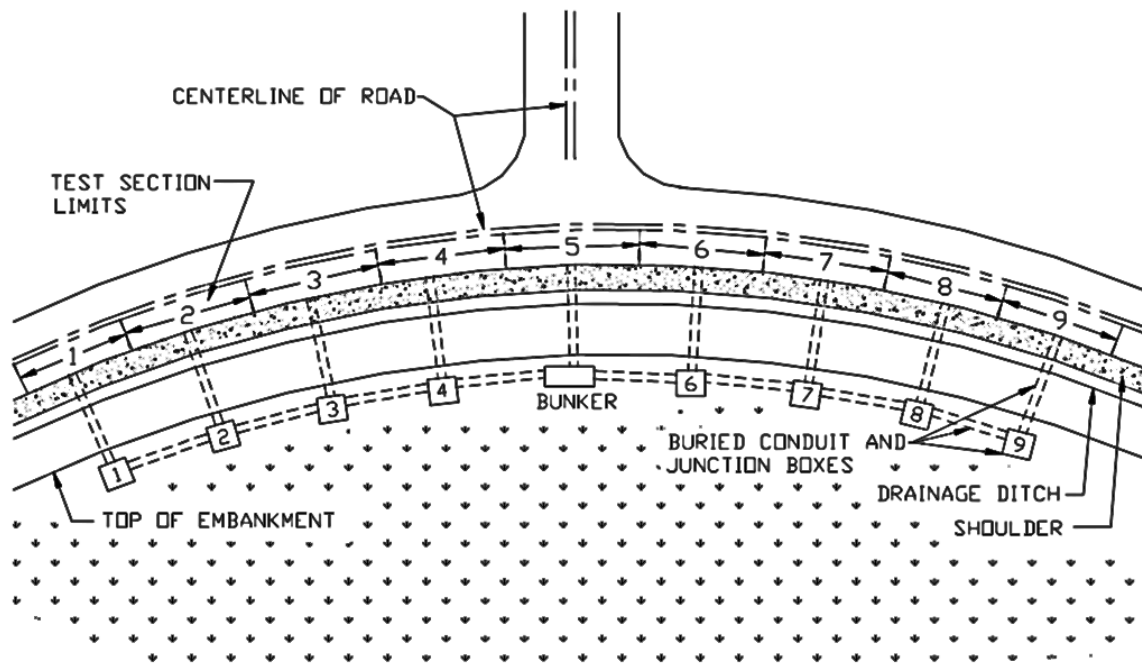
Layout of test sections installed for the research project (from Bhutta, 1998).
